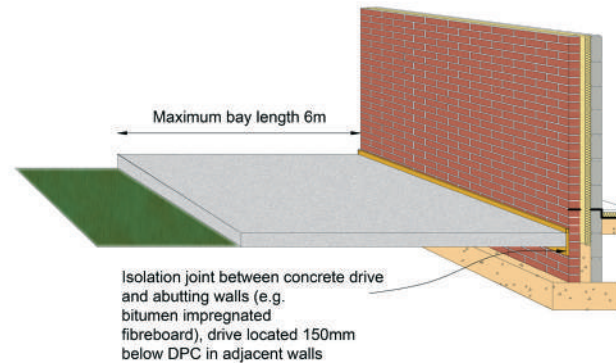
Typical cast in-situ drive or path abutting the dwelling
